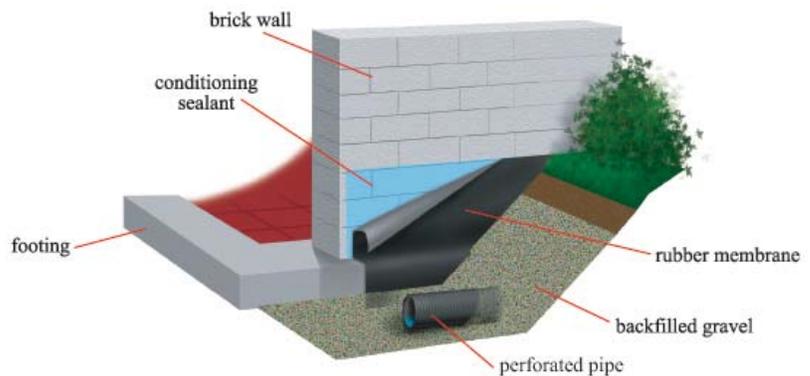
Sample cross section of proposed waterproofing and footing drain improvements
